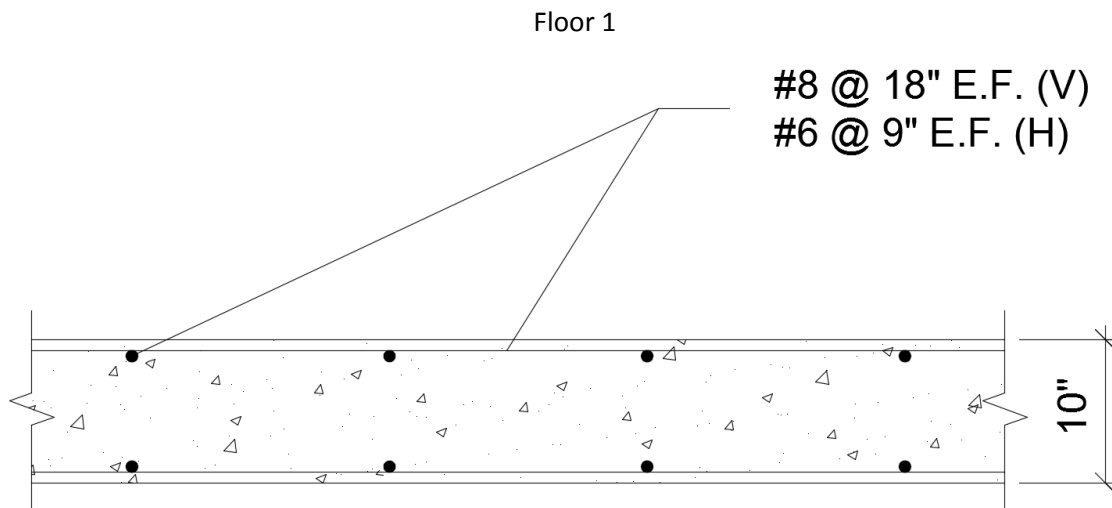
Segment of exterior wall cross-section at the 1st floor level based on SDC D design.
